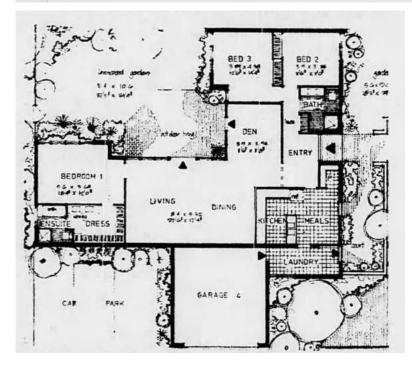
Site plan of the first house to be completed at Hamilton Close, 1978 (Age, 17 November 1978:30)
